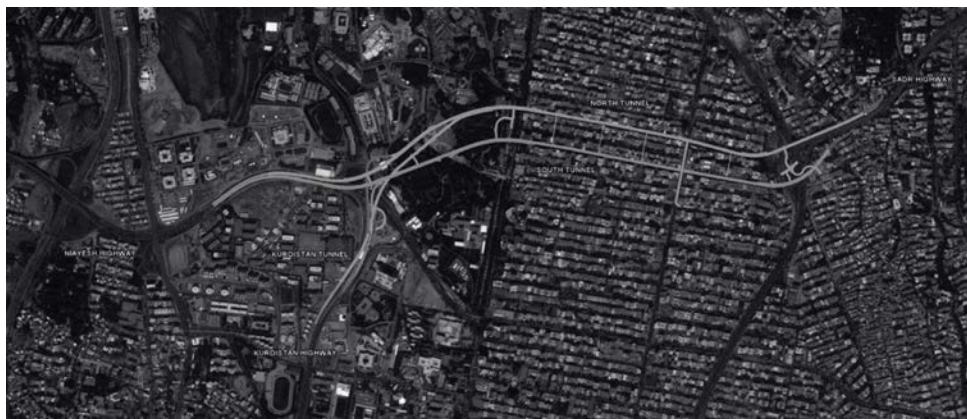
A plan of the Niayesh road tunnels in Tehran, Iran.
